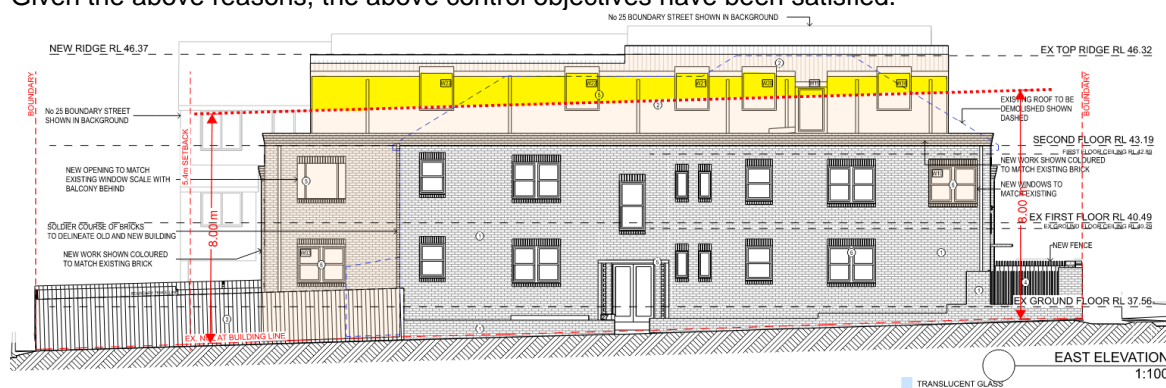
Eastern Elevation showing highlighted area of non compliant external wall height
